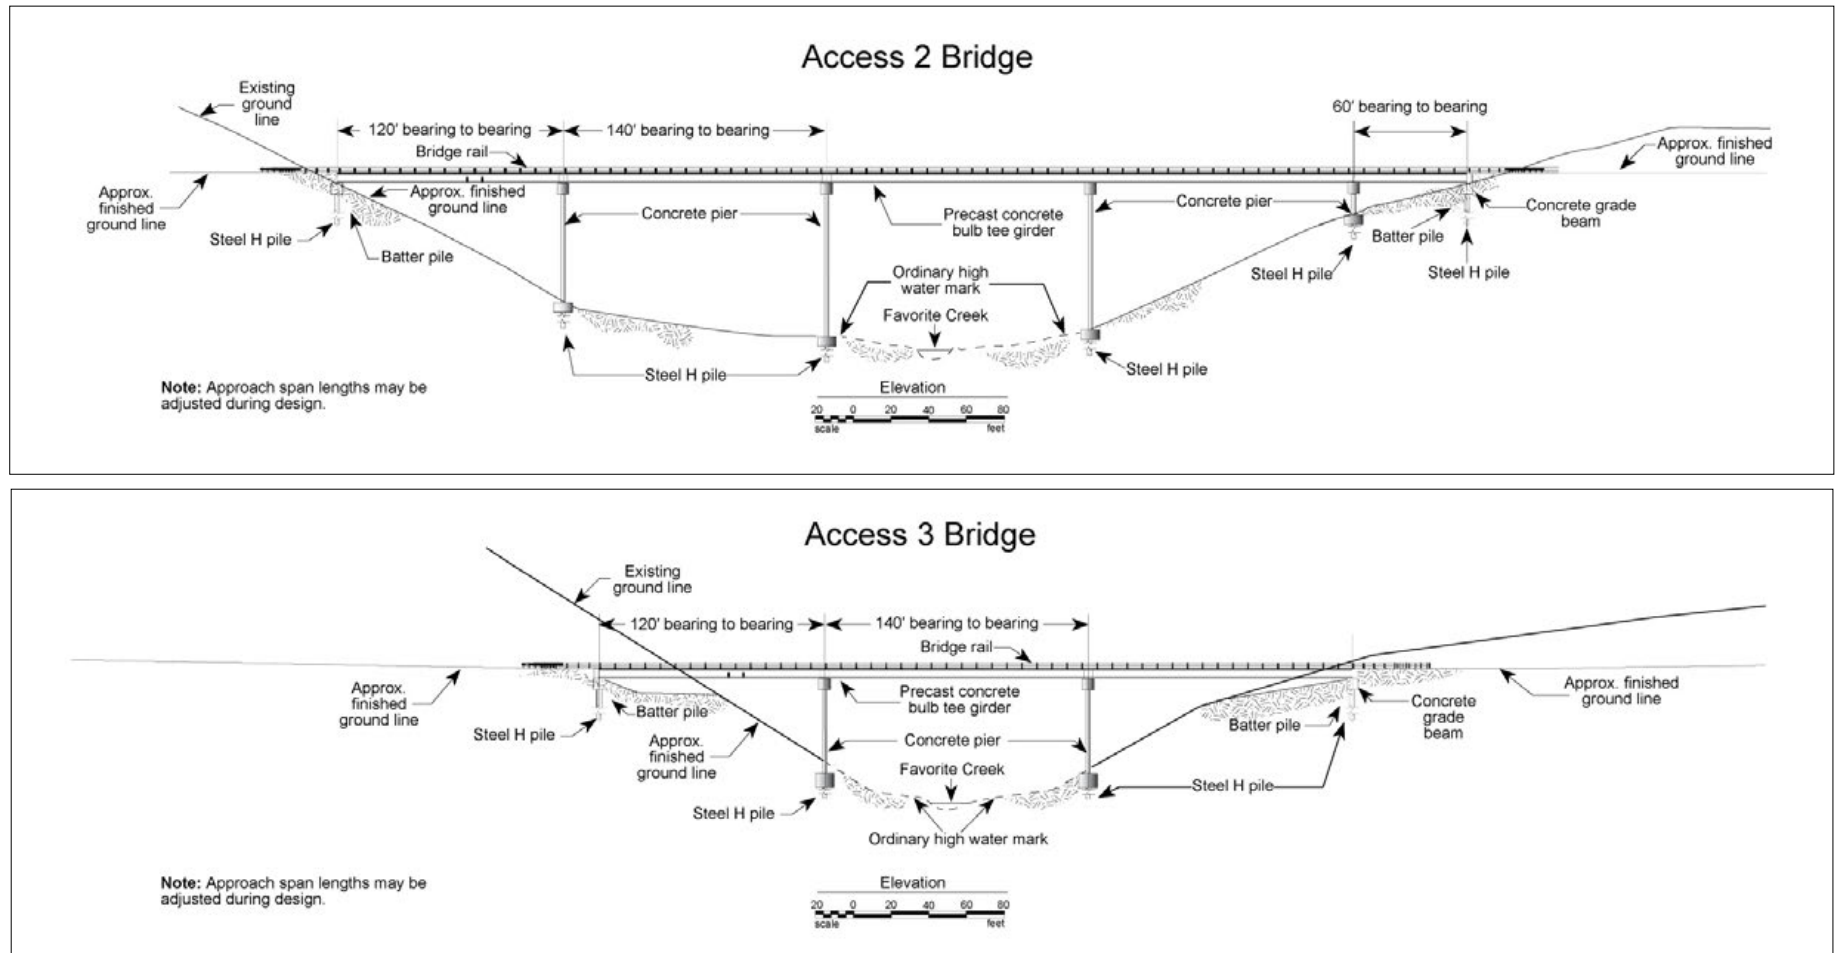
Representative cross section of the Access 2 and Access 3 bridges over Favorite Creek.
